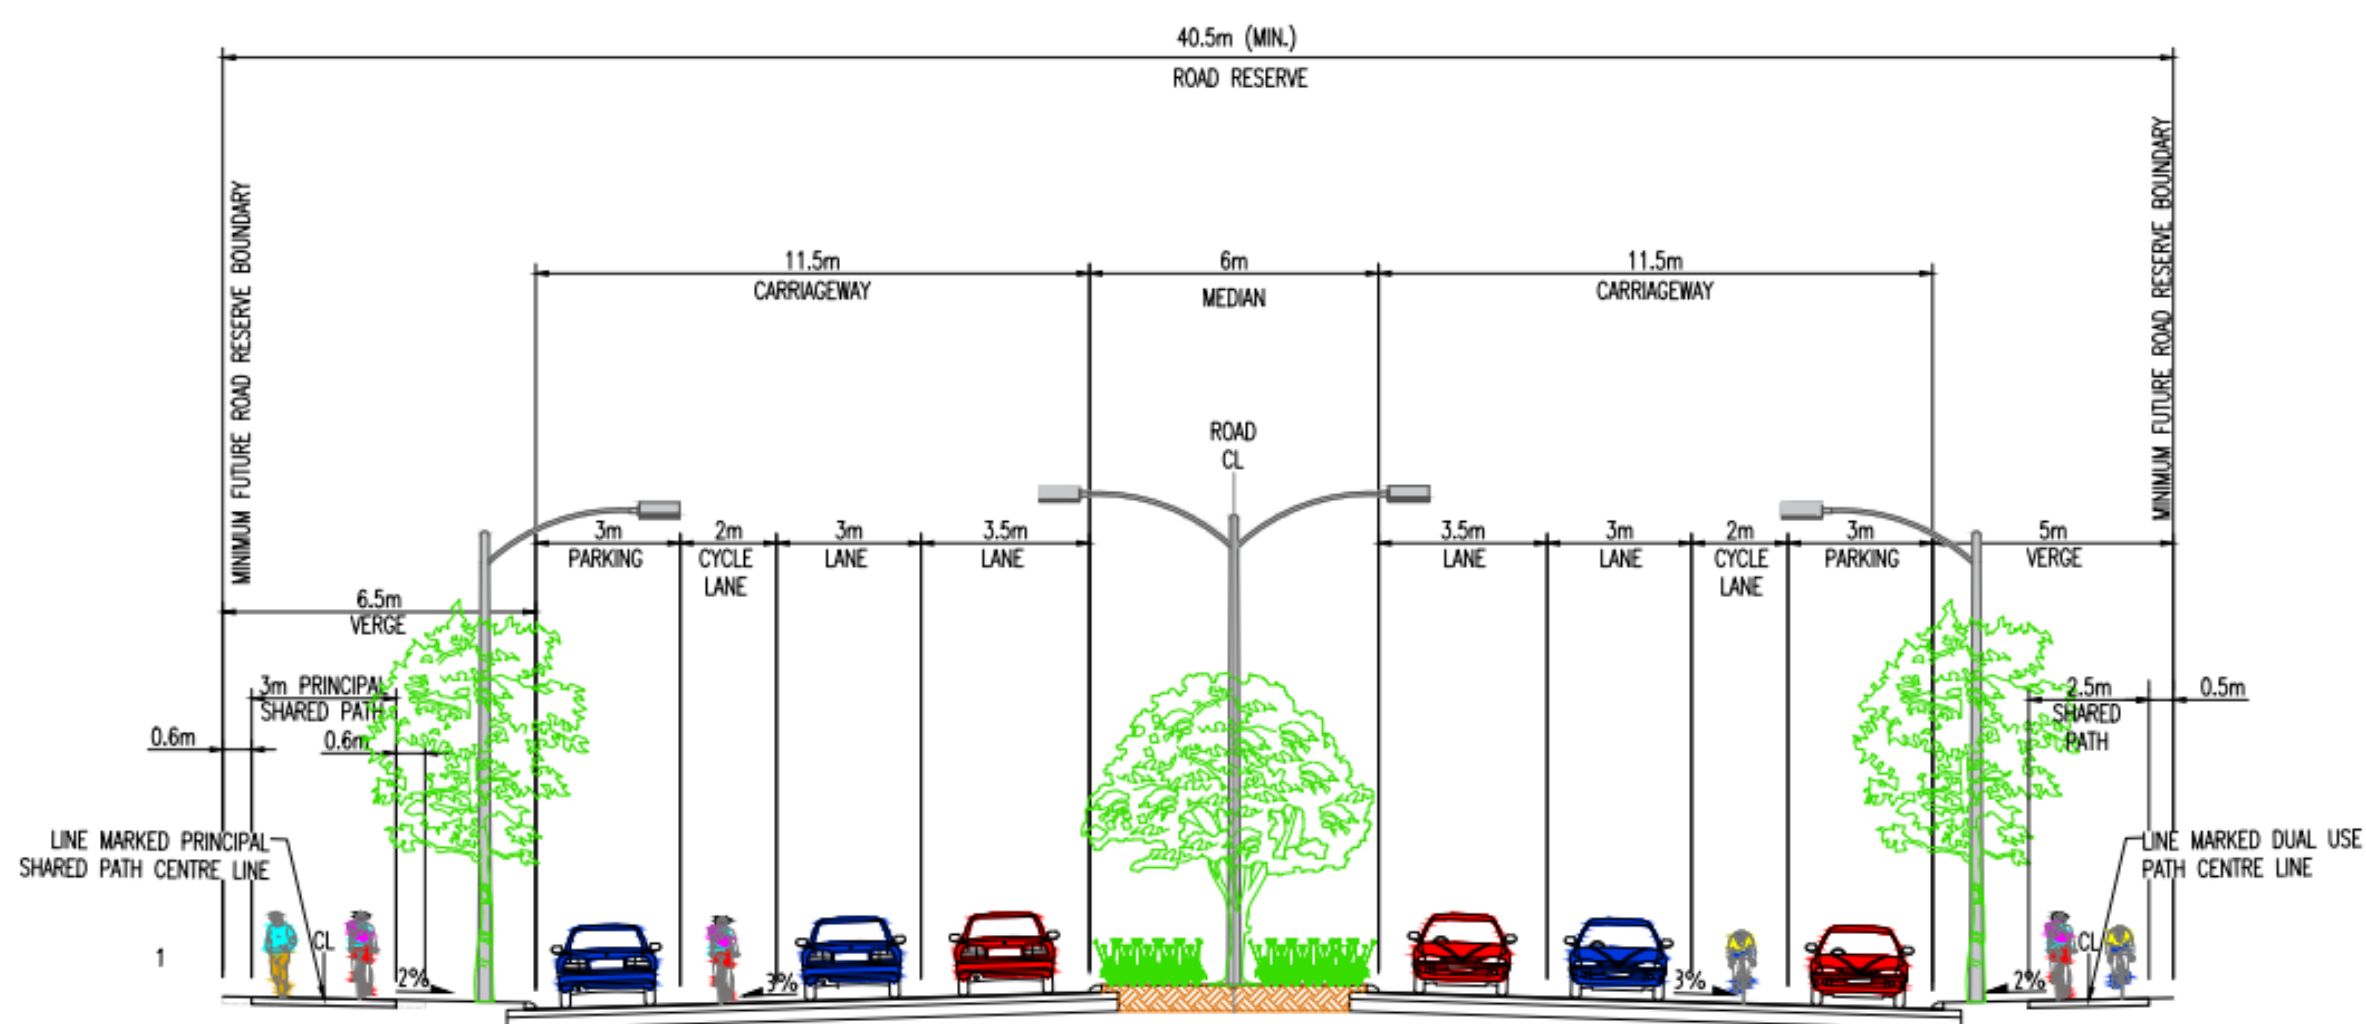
CROSS SECTION FRANKLIN ROAD (NEIGHBOURHOOD CENTRE)
